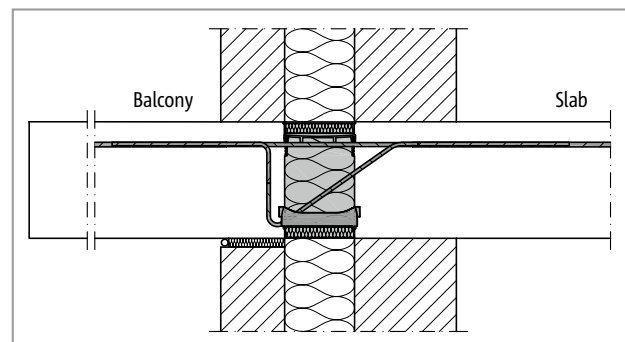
Schöck Isokorb® XT type K: Cavity wall with a balcony at inner slab level
